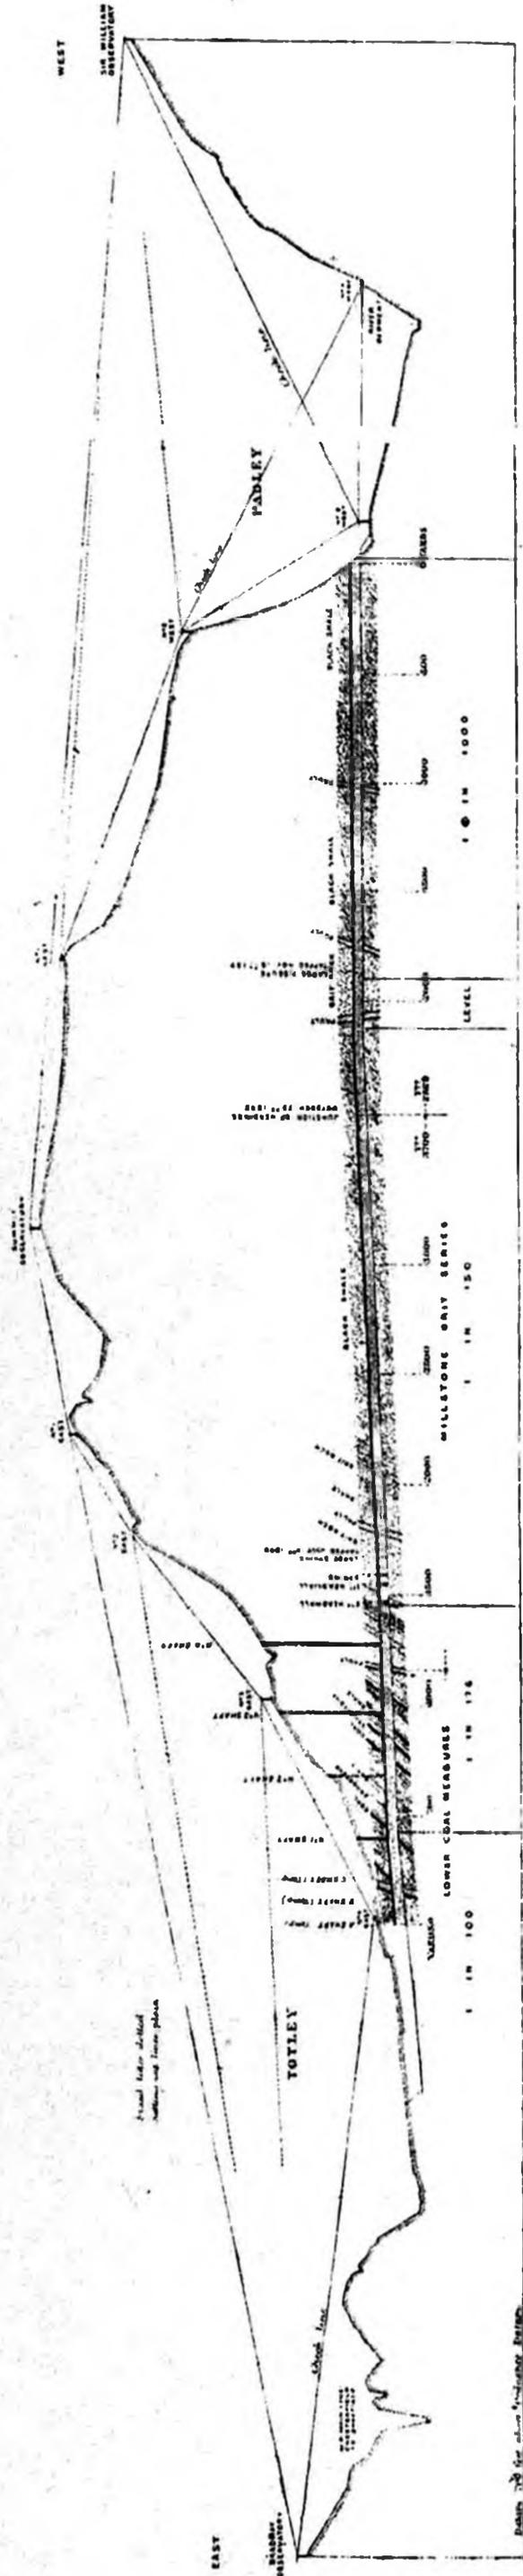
LONGITUDINAL SECTION OF TOTLEY TUNNEL. TOTAL LENGTH, 6,229 YARDS.
